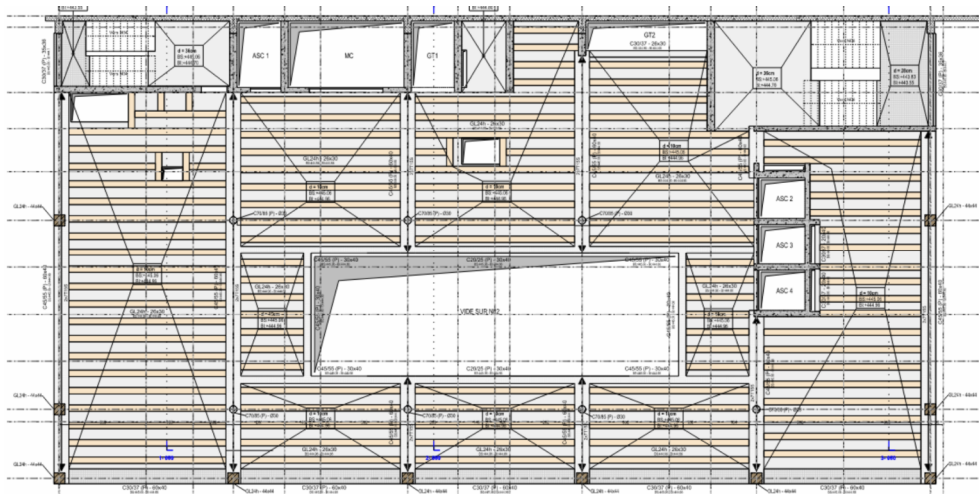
Load-bearing structure. Slab over N03 (similar to roof slab)
